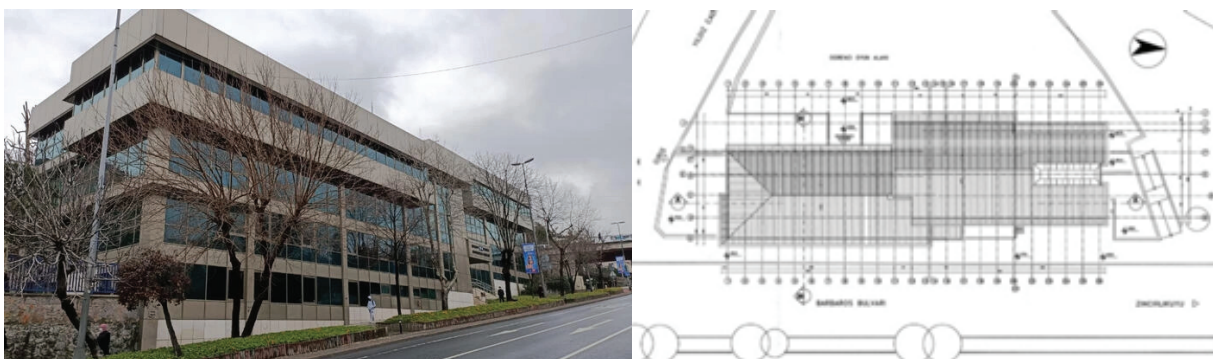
The view of the educational building from Barbaros avenue and site plan.
